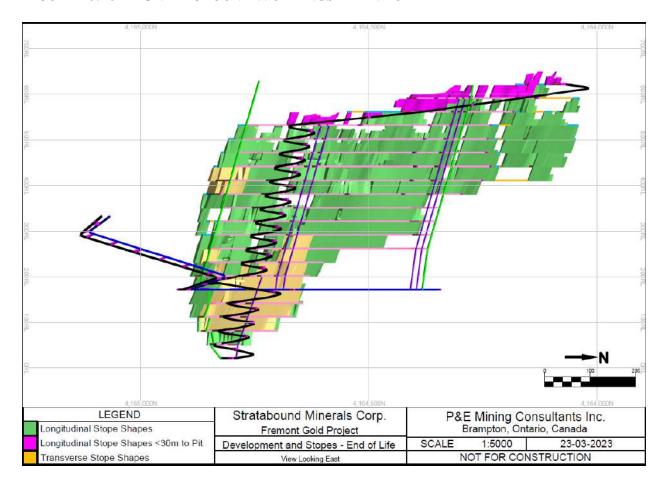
UNDERGROUND WORKINGS AT END OF LIFE
